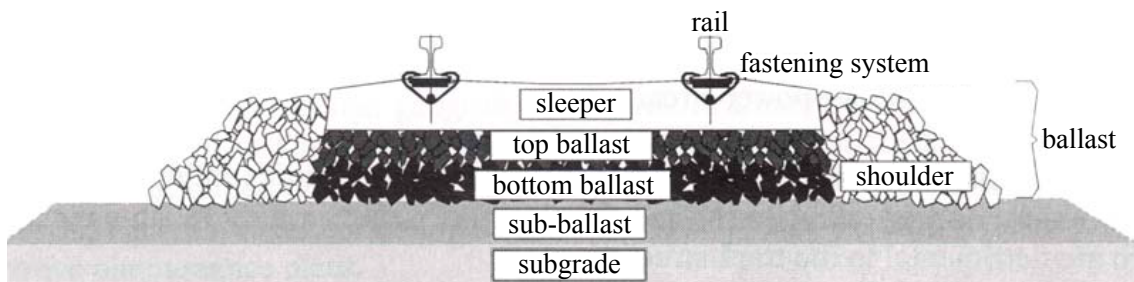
A typical cross-section of ballasted track, Selig and Waters, 1994.
